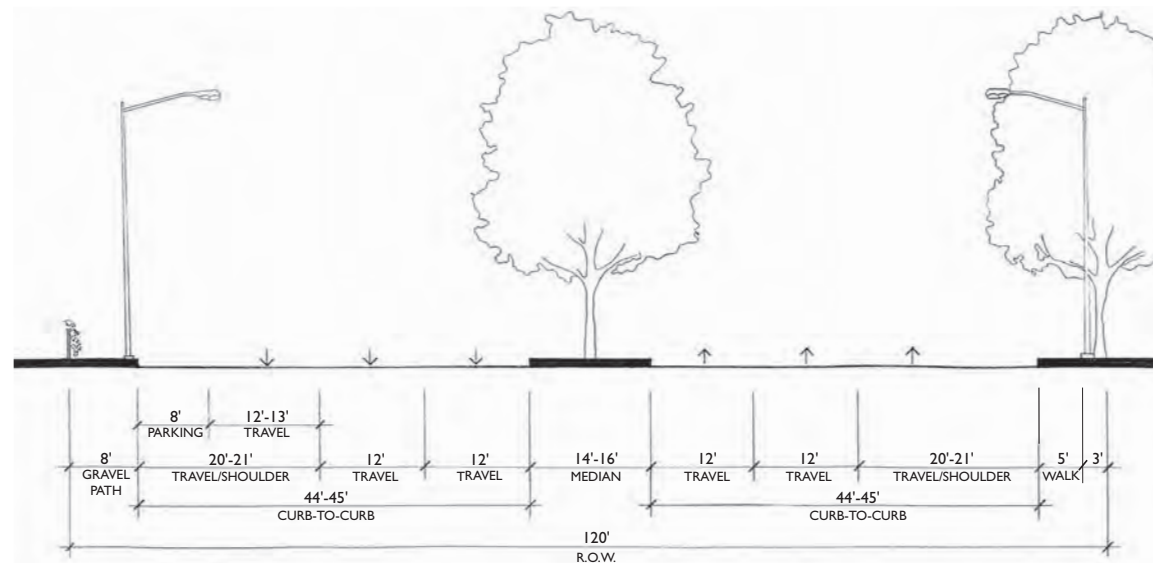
Typical existing 'Stanford' 6-Lane Cross-sections
